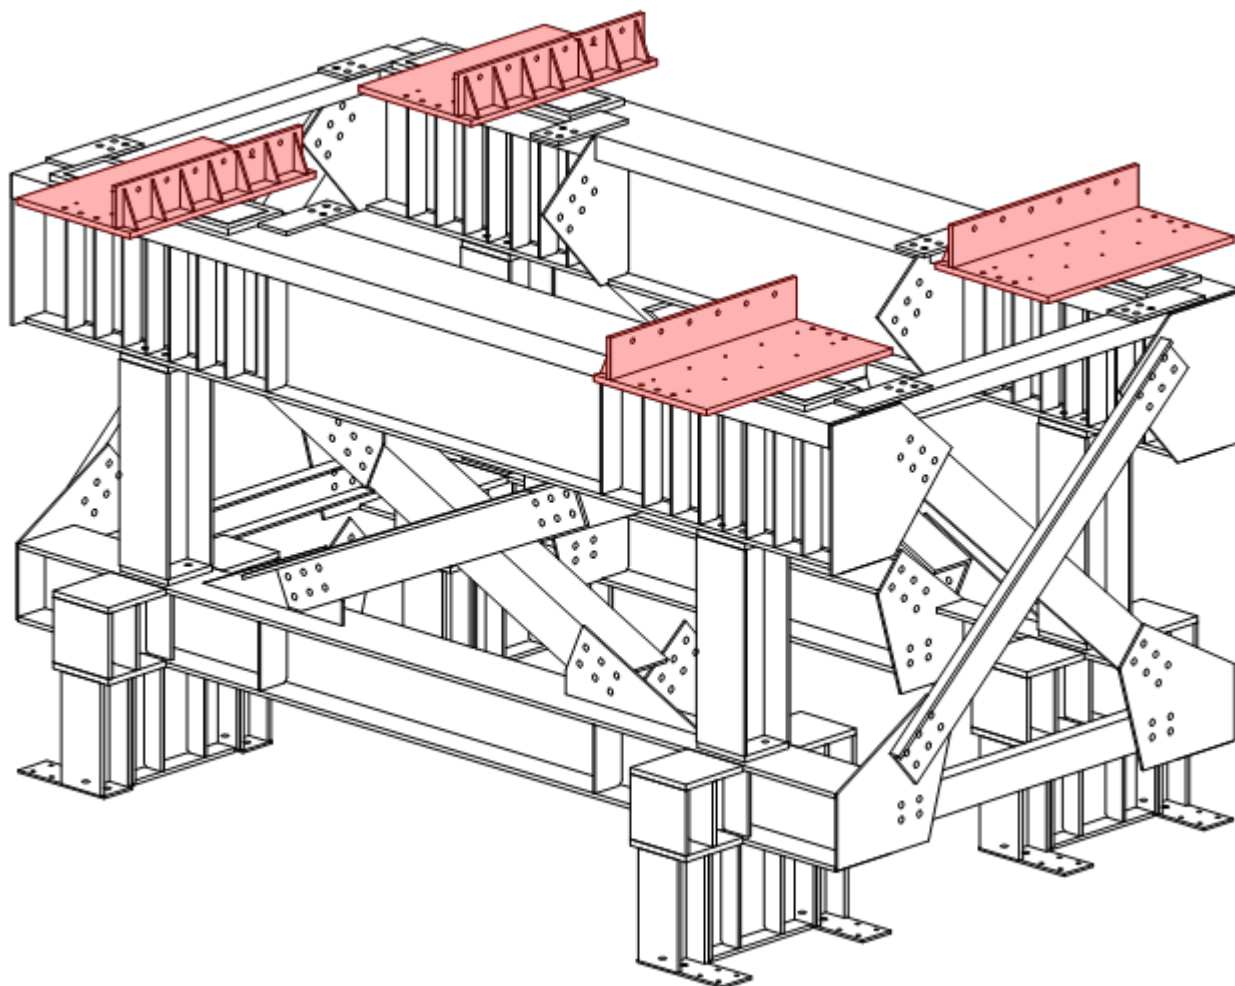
Render of North lift shaft steel below level 1 (MJH Engineering). Steel plate armouring above the isolation plane is shown shaded. Existing structure not shown.
